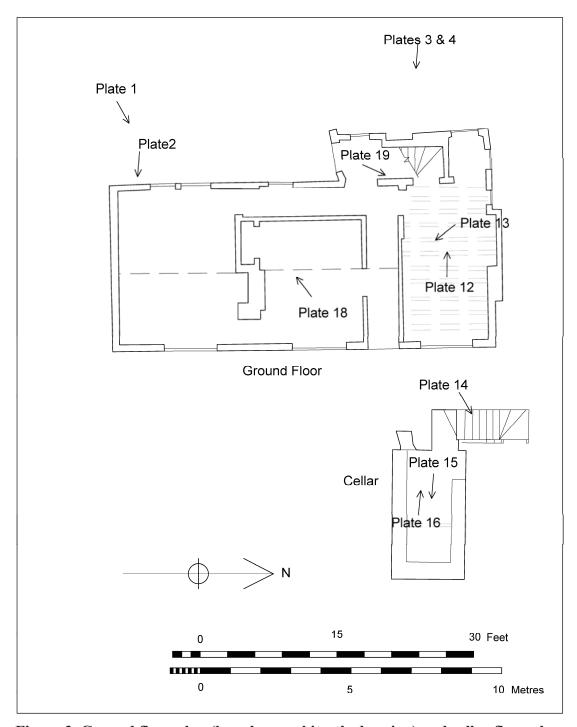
Ground floor plan (based on architect's drawing) and cellar floor plan, with location of plates used to illustrate report.
